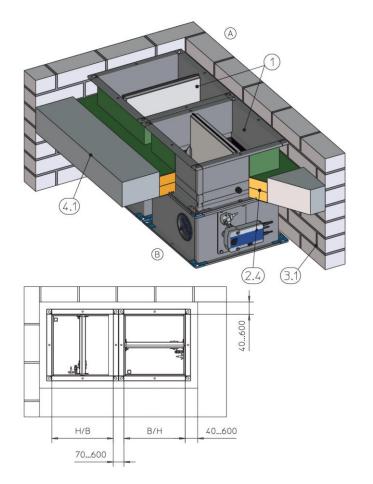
Dry mortarless installation into a solid ceiling slab, with a fire batt, suspended
